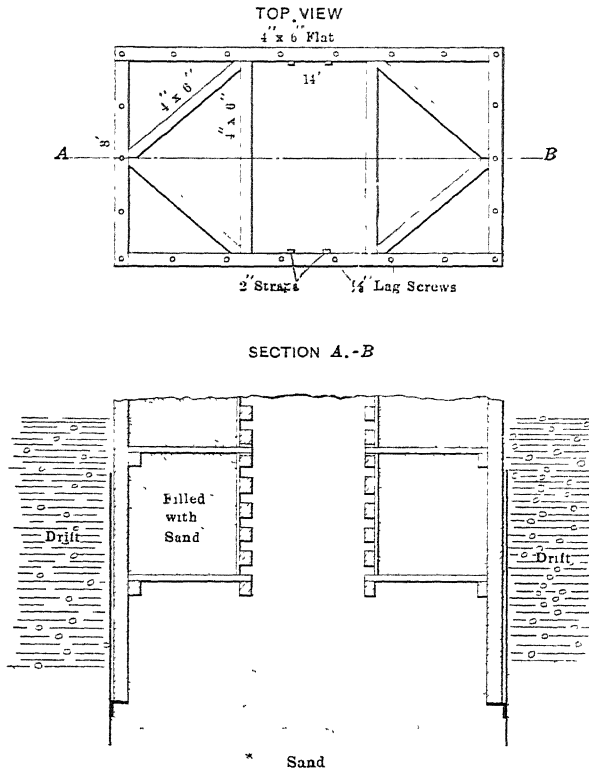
METHOD EMPLOYED IN SINKING AIR SHAFT.
